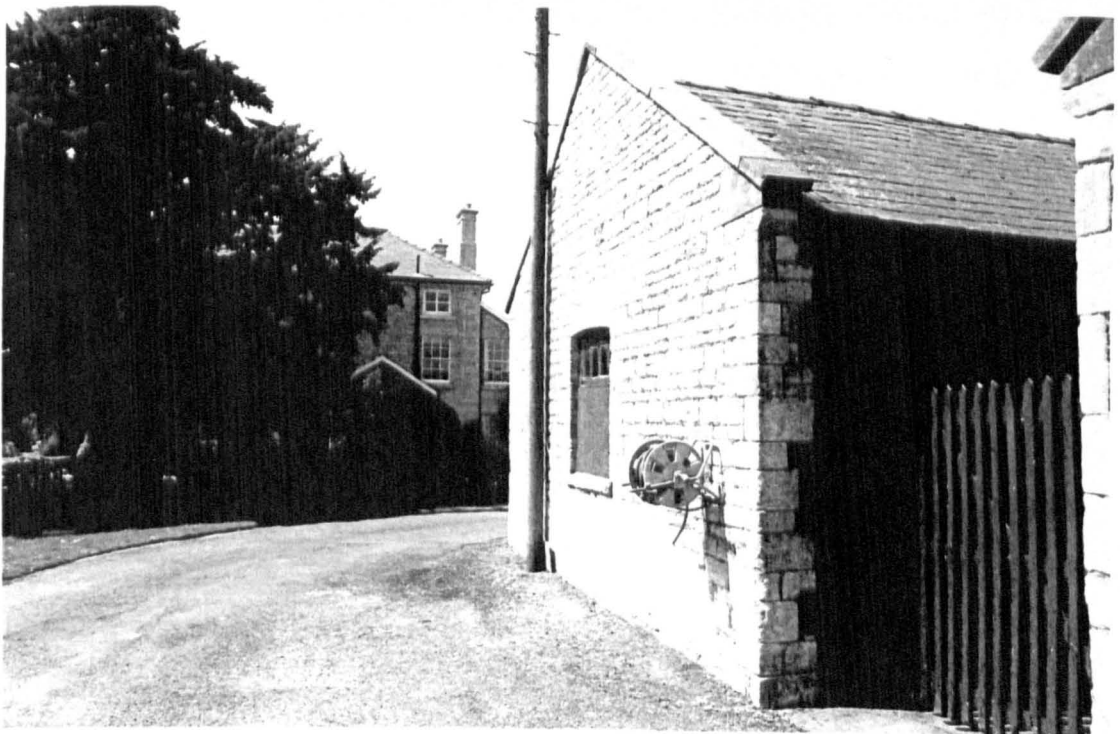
Detail of the different walling materials, Woodnook Farm, Little Ponton
